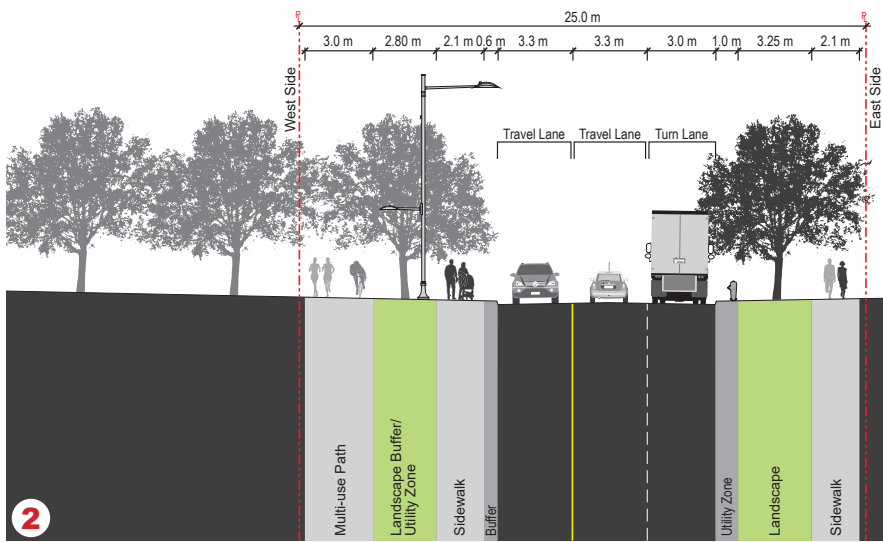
Proposed street right-of-way cross-section - Brentcliffe Road
